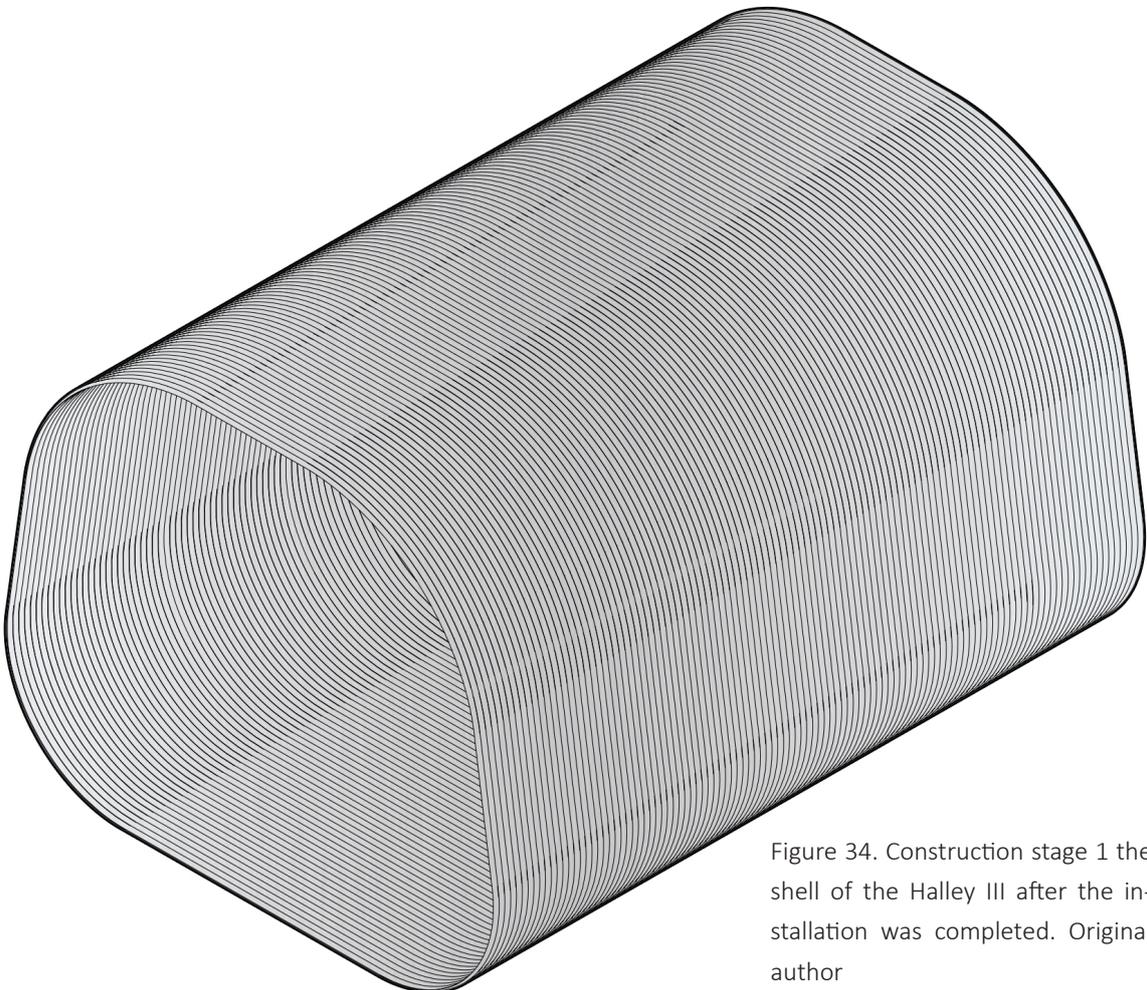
Construction stage 1 the shell of the Halley III after the installation was completed. Original author
